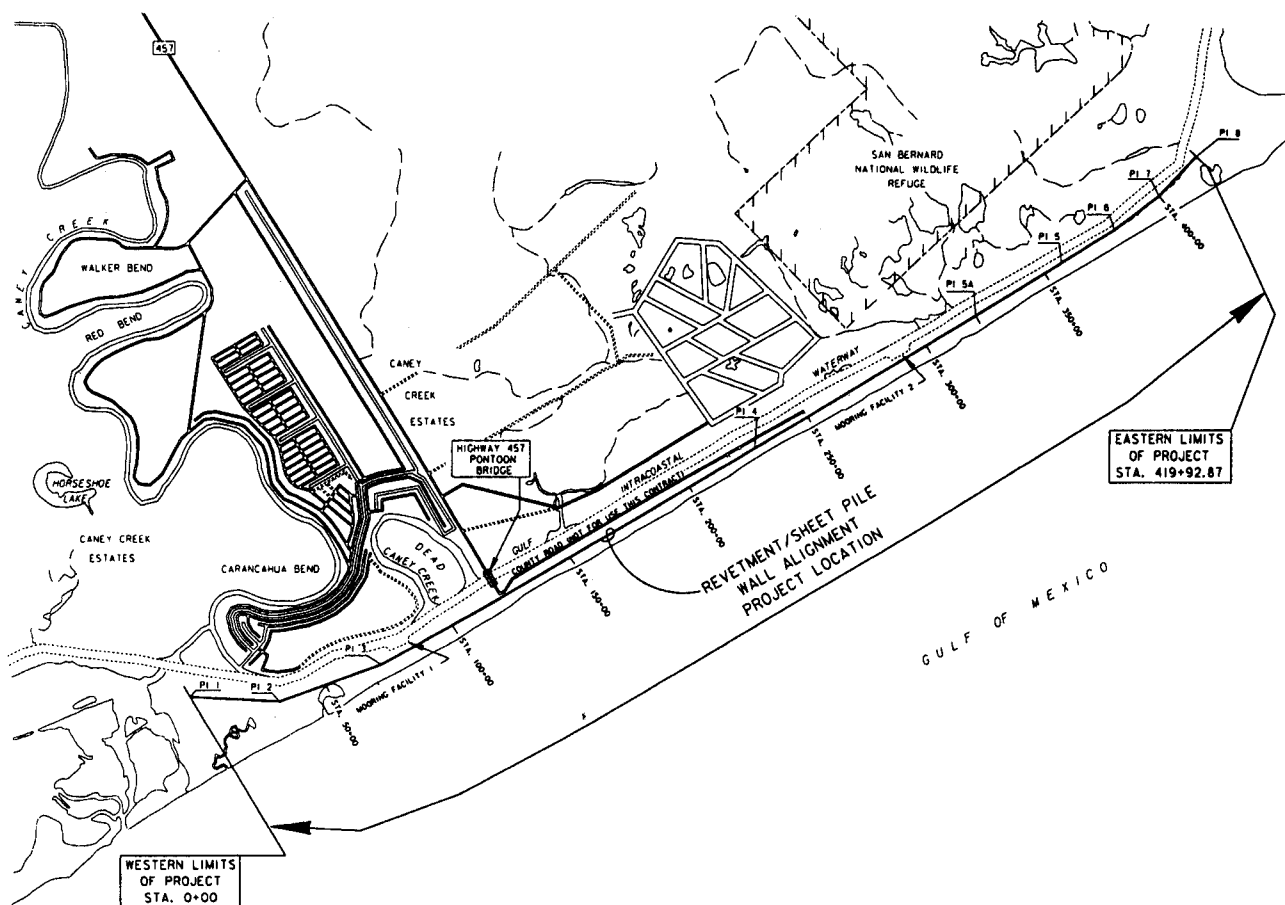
Plan View of Revetment (0.305 m = 1 ft)
